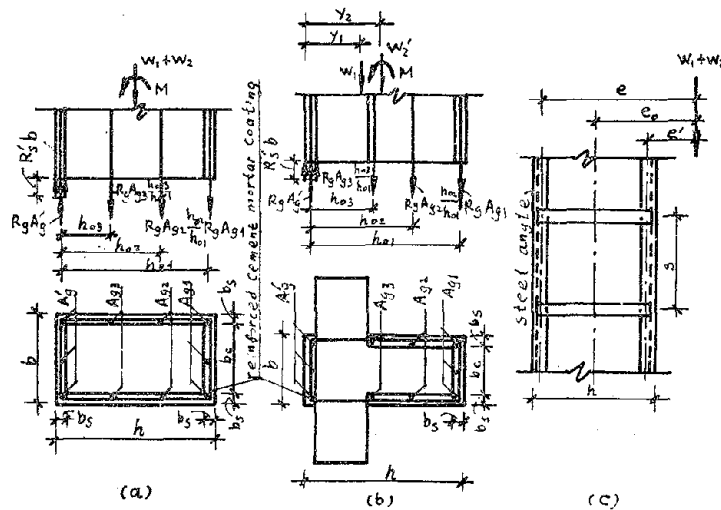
Schematic diagram for calculating strength of cross section of strengthened brick column
